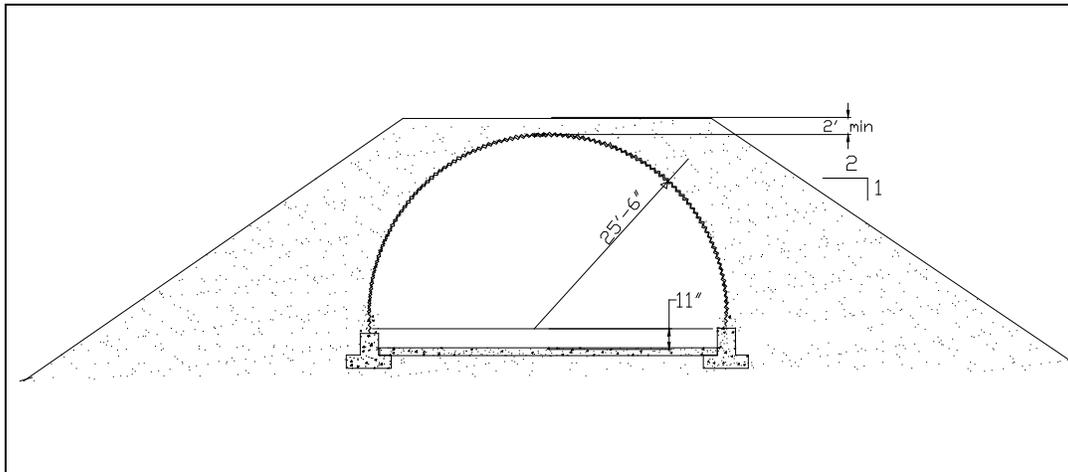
Section in a typical ammunition and explosive storage magazine.
